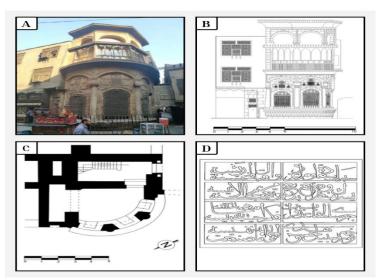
A) Main elevation of Nafisa Al-Bayda sabil and kuttab; B) The western facade (Researchers drawing after the American Research Center); C) Plan of the first floor of the sabil (after the American Research Center) illustrates the façade of the sabil and kuttab and its connection to the agency; D) Some inscriptions on the façade of Sabil Nafisa al-Bayda (Researchers drawing).
